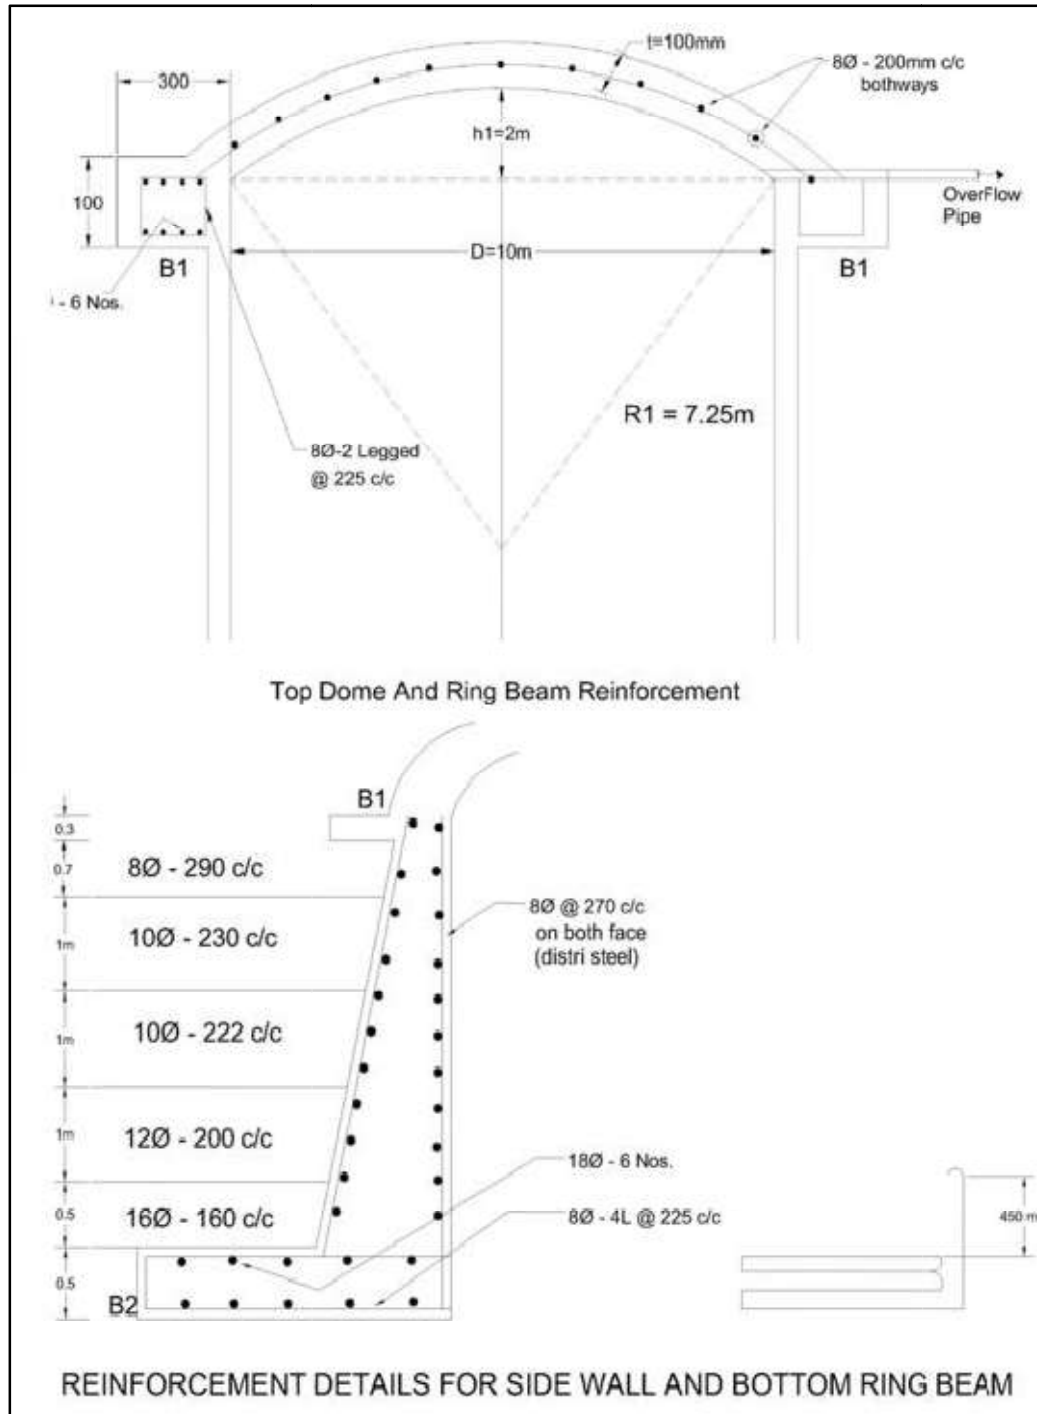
Elevation of Overhead Tank with their Reinforcement details
